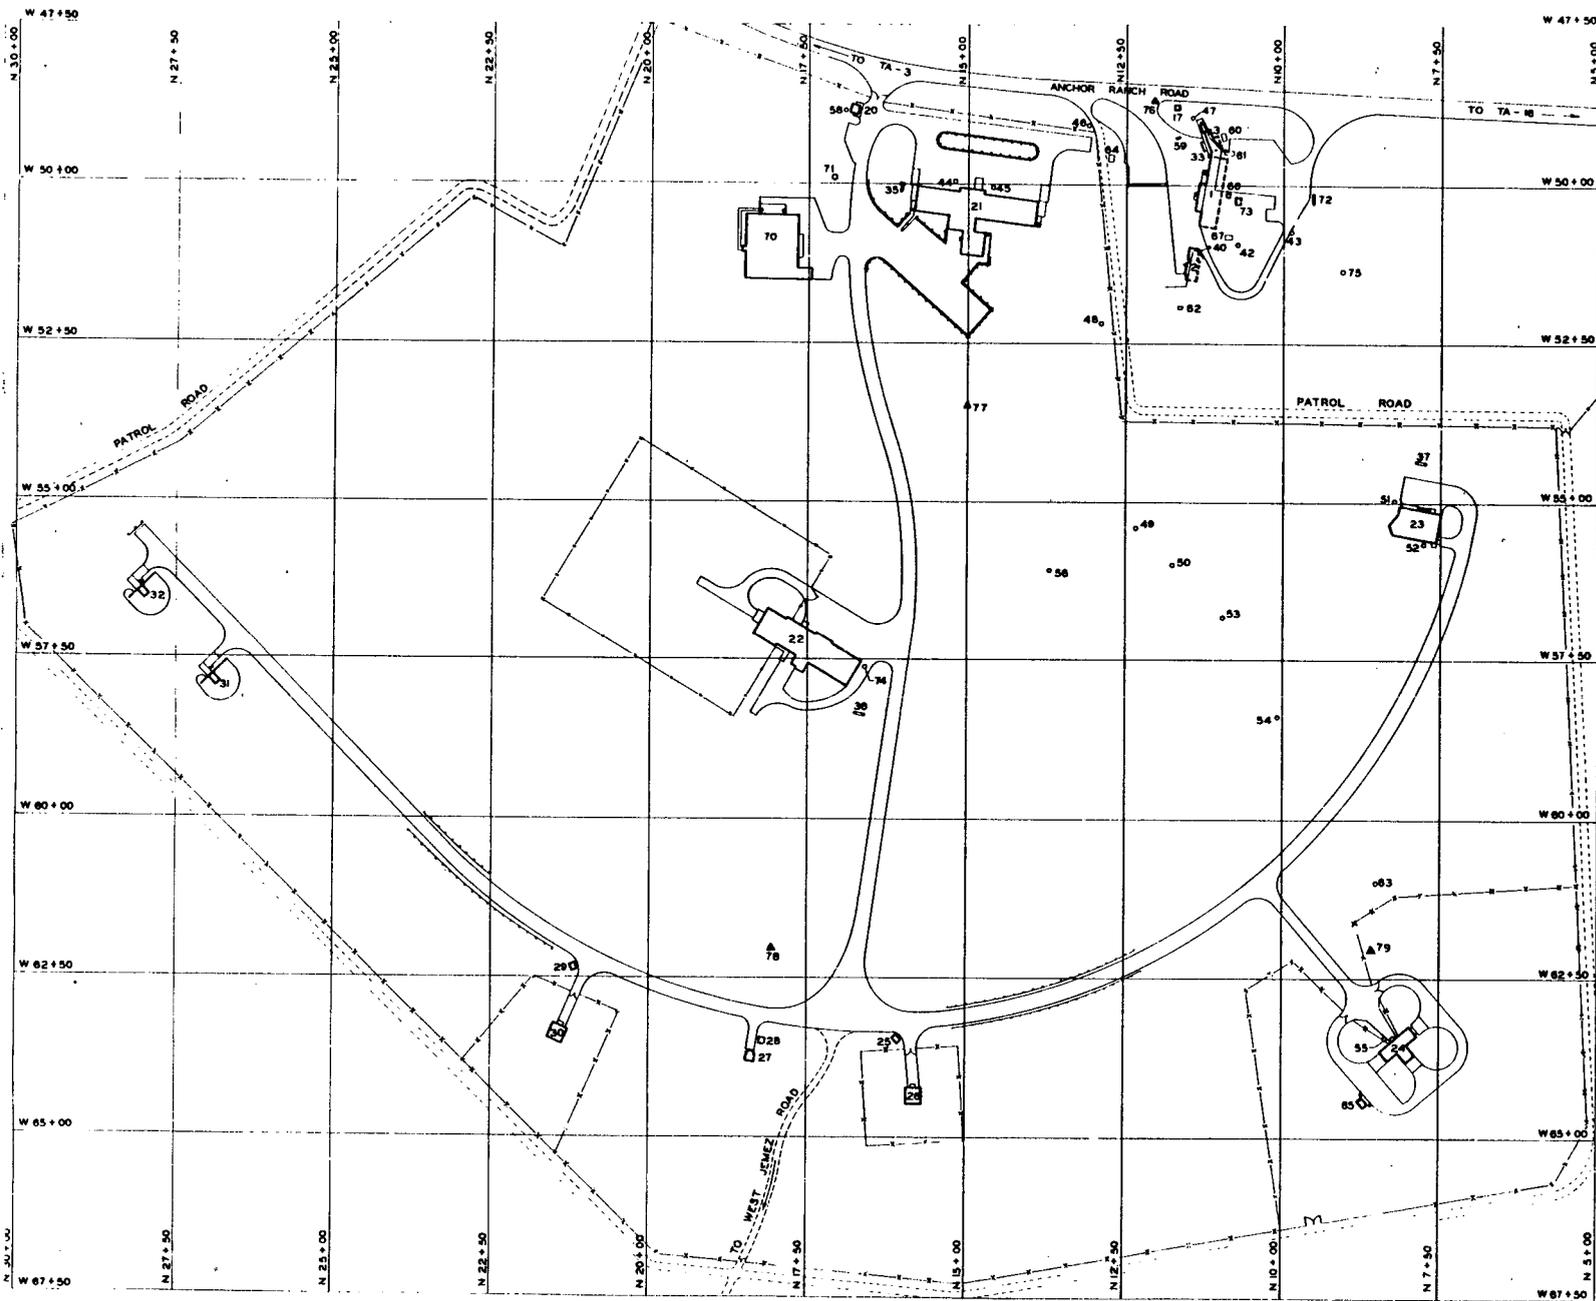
Structure Location Plan for TA-8 - Anchor Site West (1961 Drawing from the LANL Technical Area Structure Location Plans)
